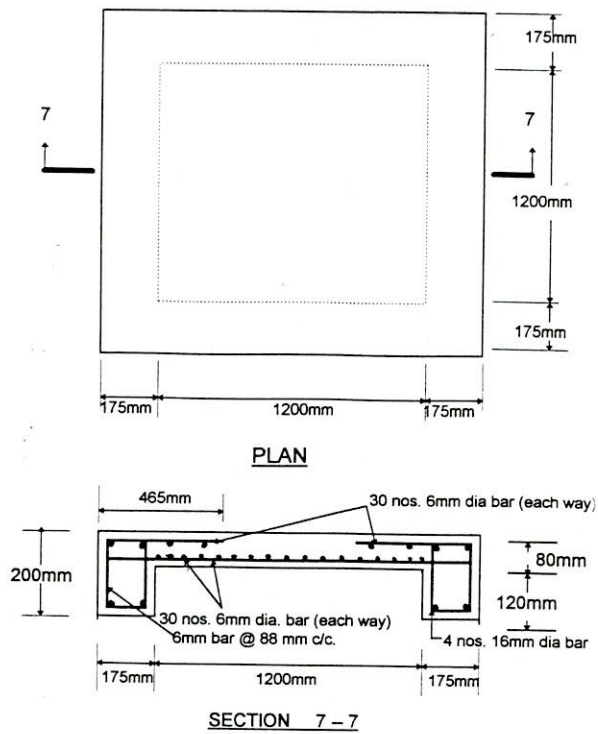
(a) Plan (b) Section and reinforcement details of SLAB7
